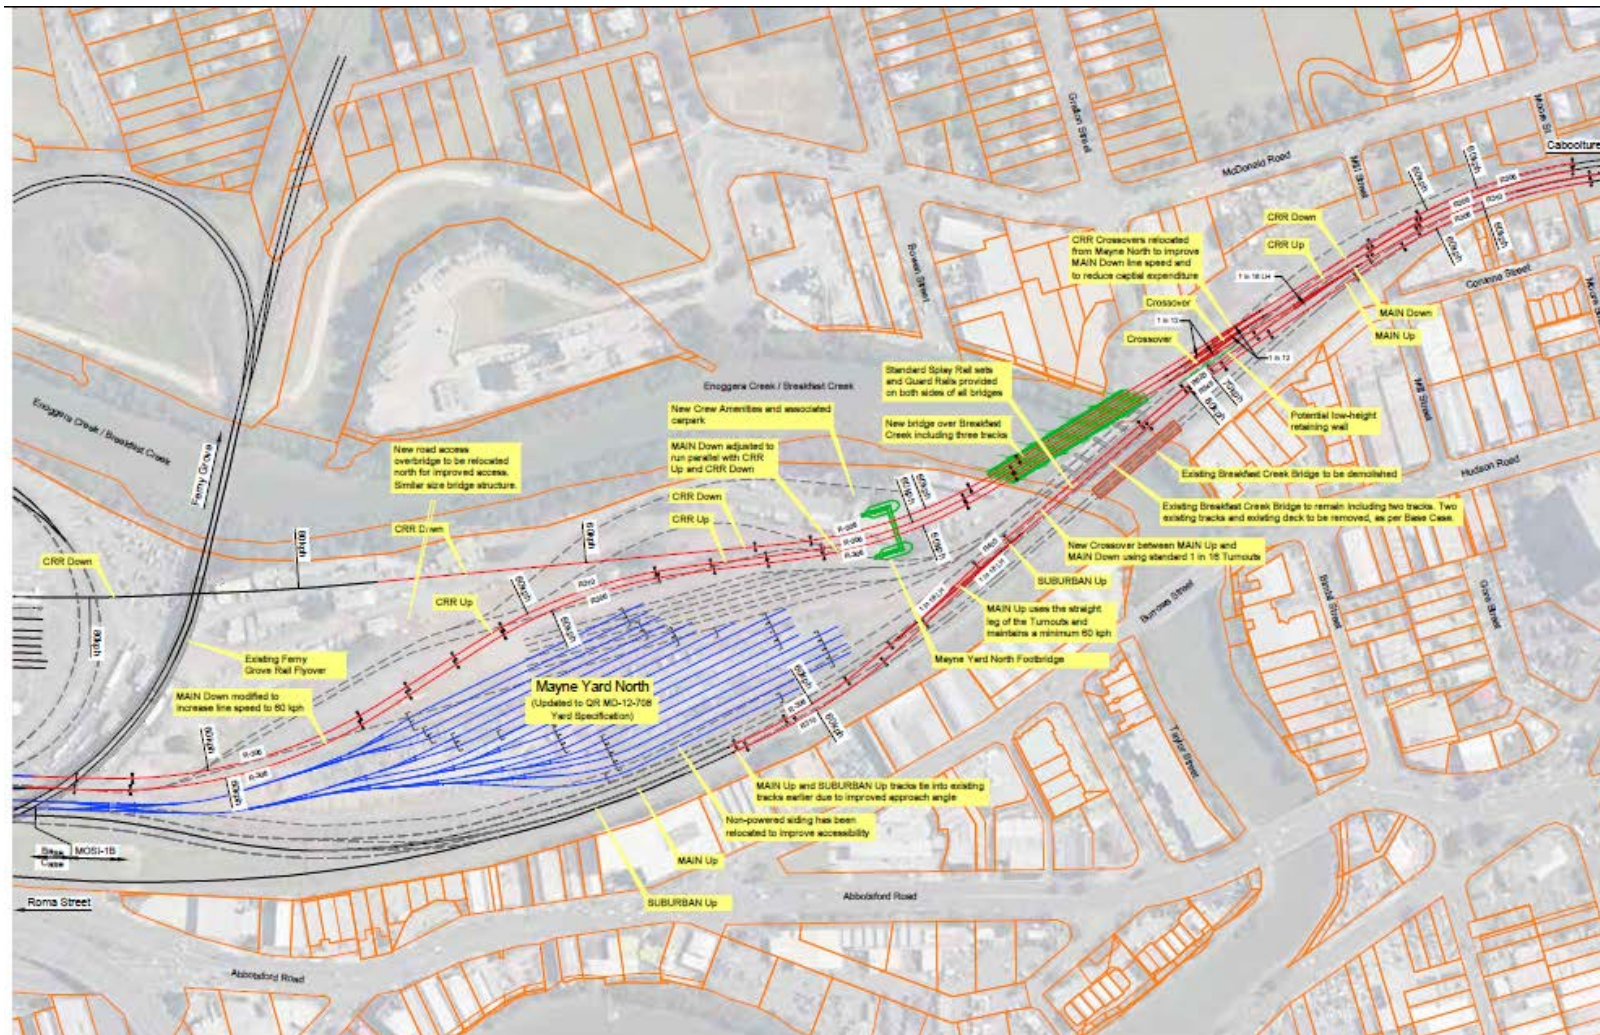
Mayne Yard north proposed changes and new Breakfast Creek bridge
